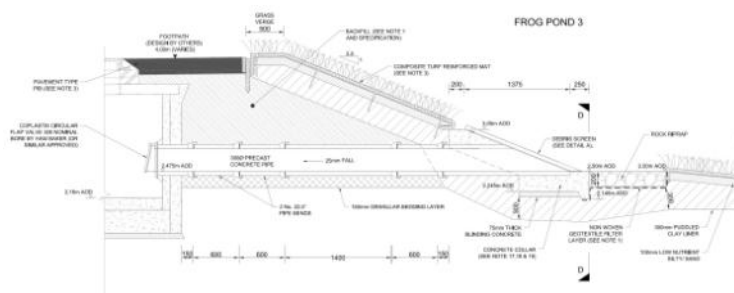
Cross Section through habitat pond outlet (Barry Plowright)
